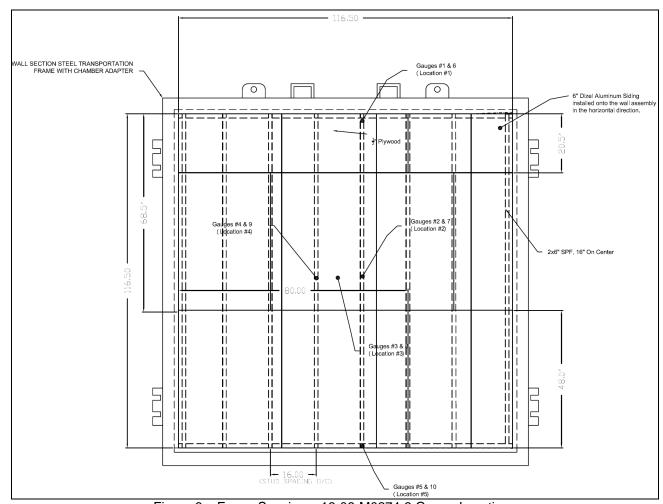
Exova Specimen 16-06-M0274-3 Gauge Locations
